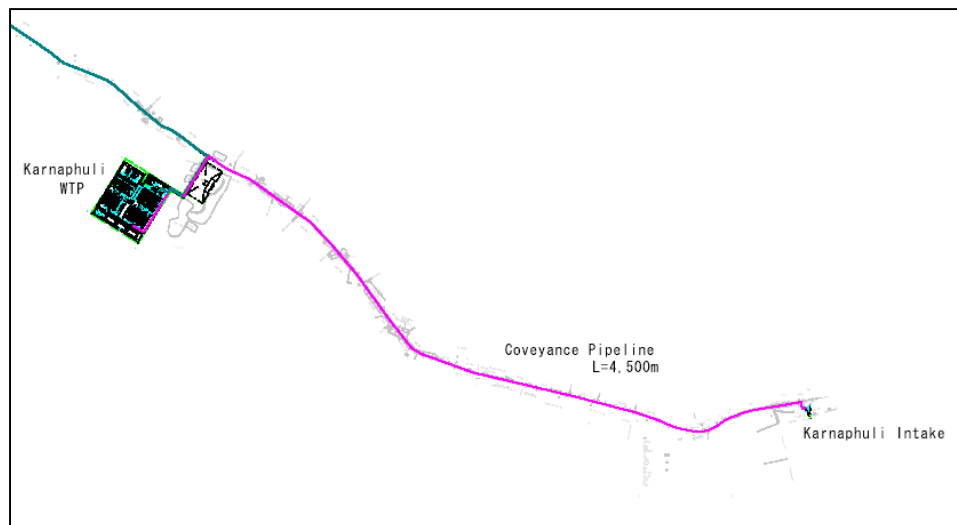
General Layout Plan of Conveyance Pipeline
